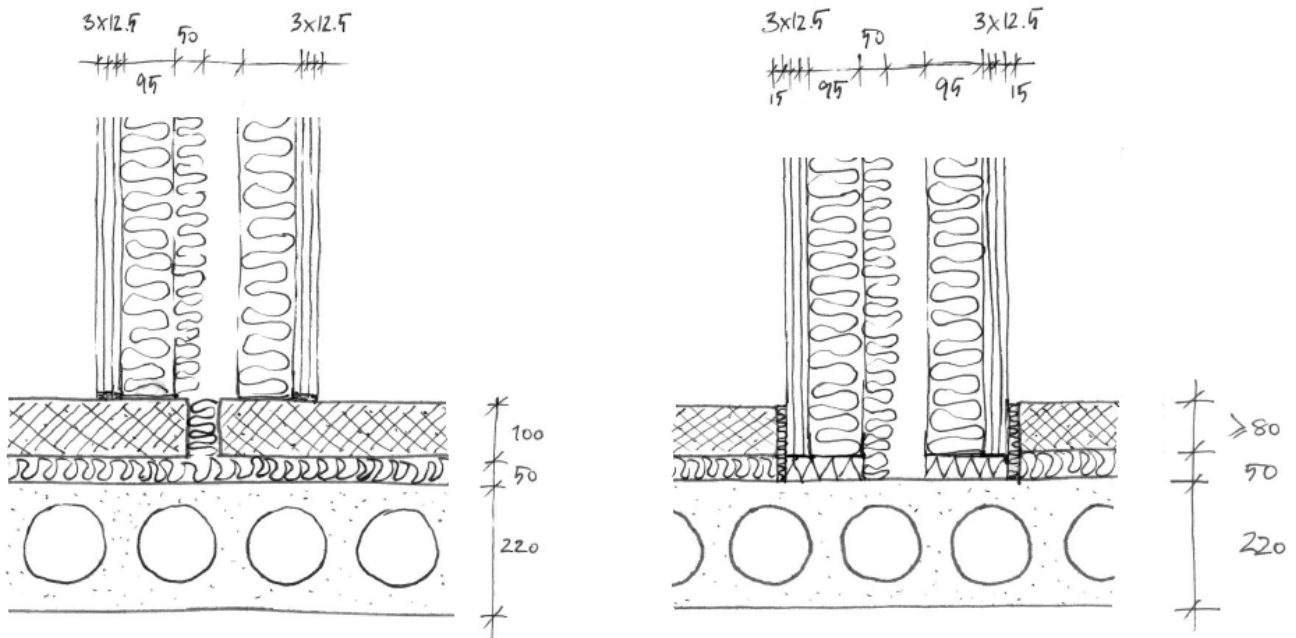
Sketches of the revision of the wall/floor junction due to reduced available heights. Sketch on the right shows the floating floor and wall are positioned on two different types of insulation.
